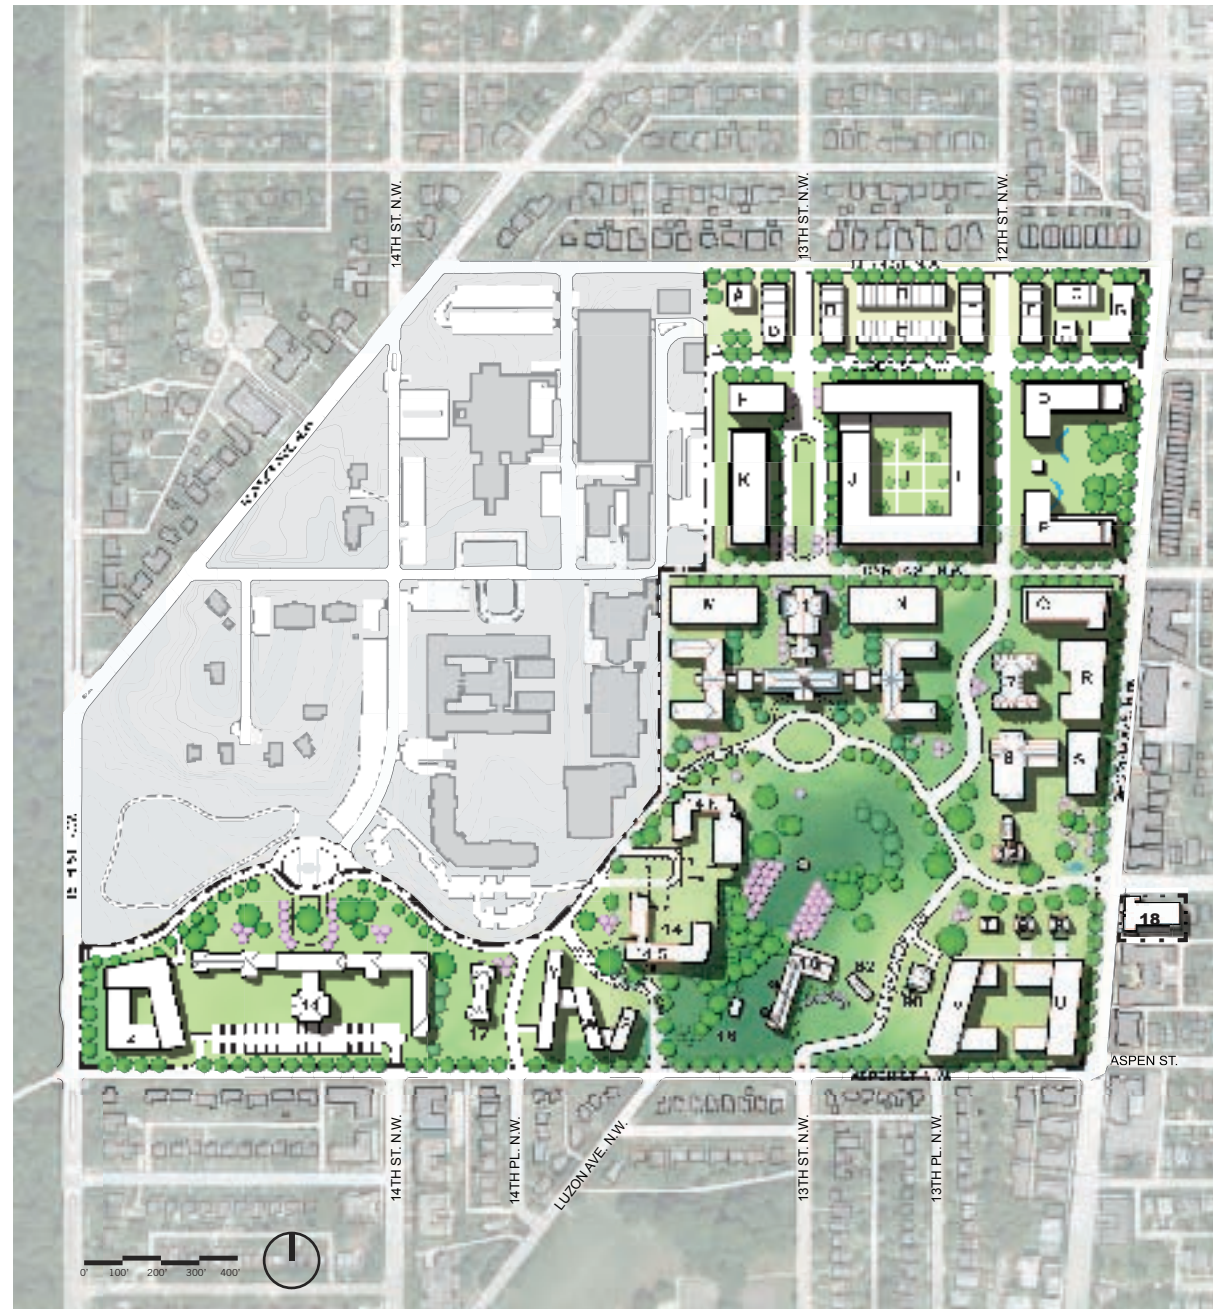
Proposed Development from the Walter Reed Reuse Plan July 13, 2012 Source: Perkins+Will
